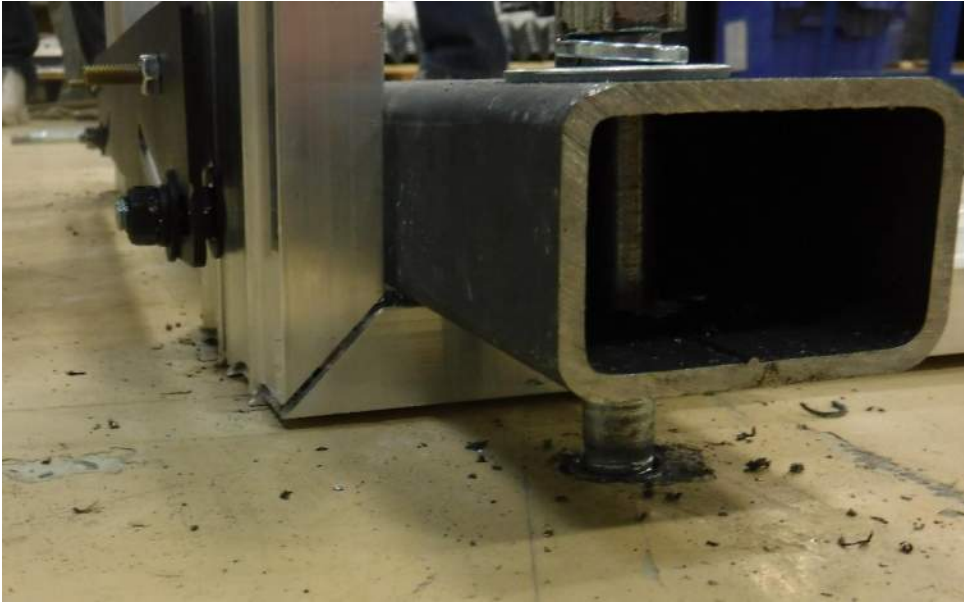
Test LT-5, Side Angle Test 3 [1100 LBS]
